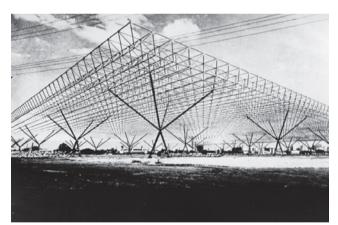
Roof structure for *Inter-American Exhibition Centre*, Sao Paolo, Brazil – under construction
